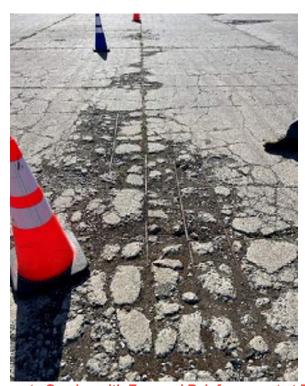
Spalling of Concrete Overlay with Exposed Reinforcement at Bent 34. Similar Damage Present in Multiple Locations between Bent 25 and Bent 100.
